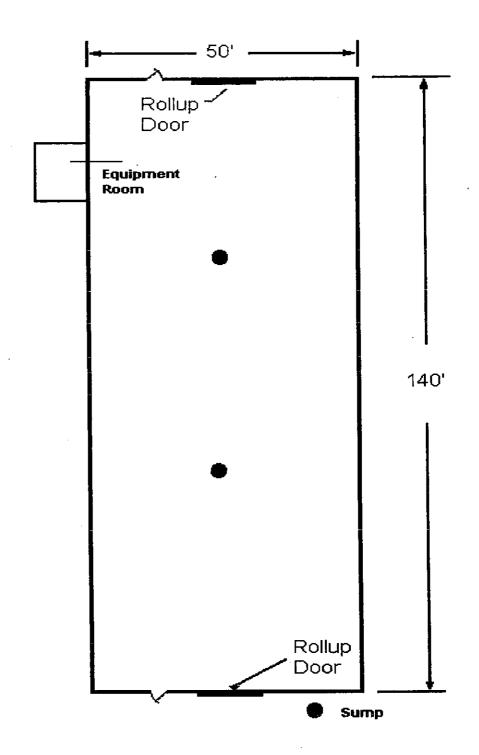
CH-TRU Waste Storage Facility, Building 7572.
